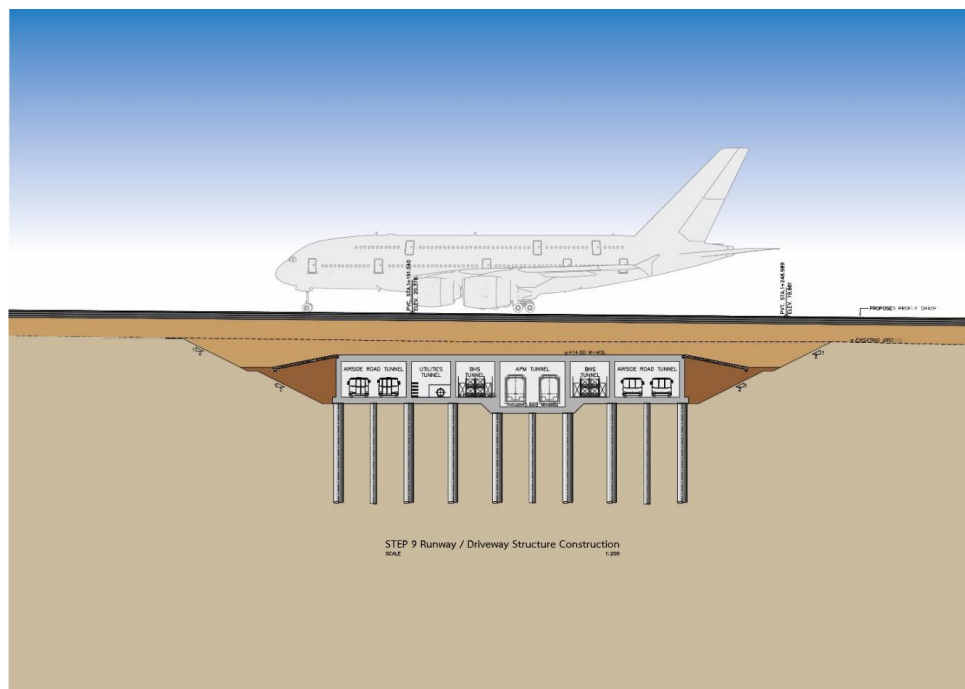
Long cross section of APM tunnel, baggage transportation tunnel and public utilities tunnel to be constructed in Phase 1
